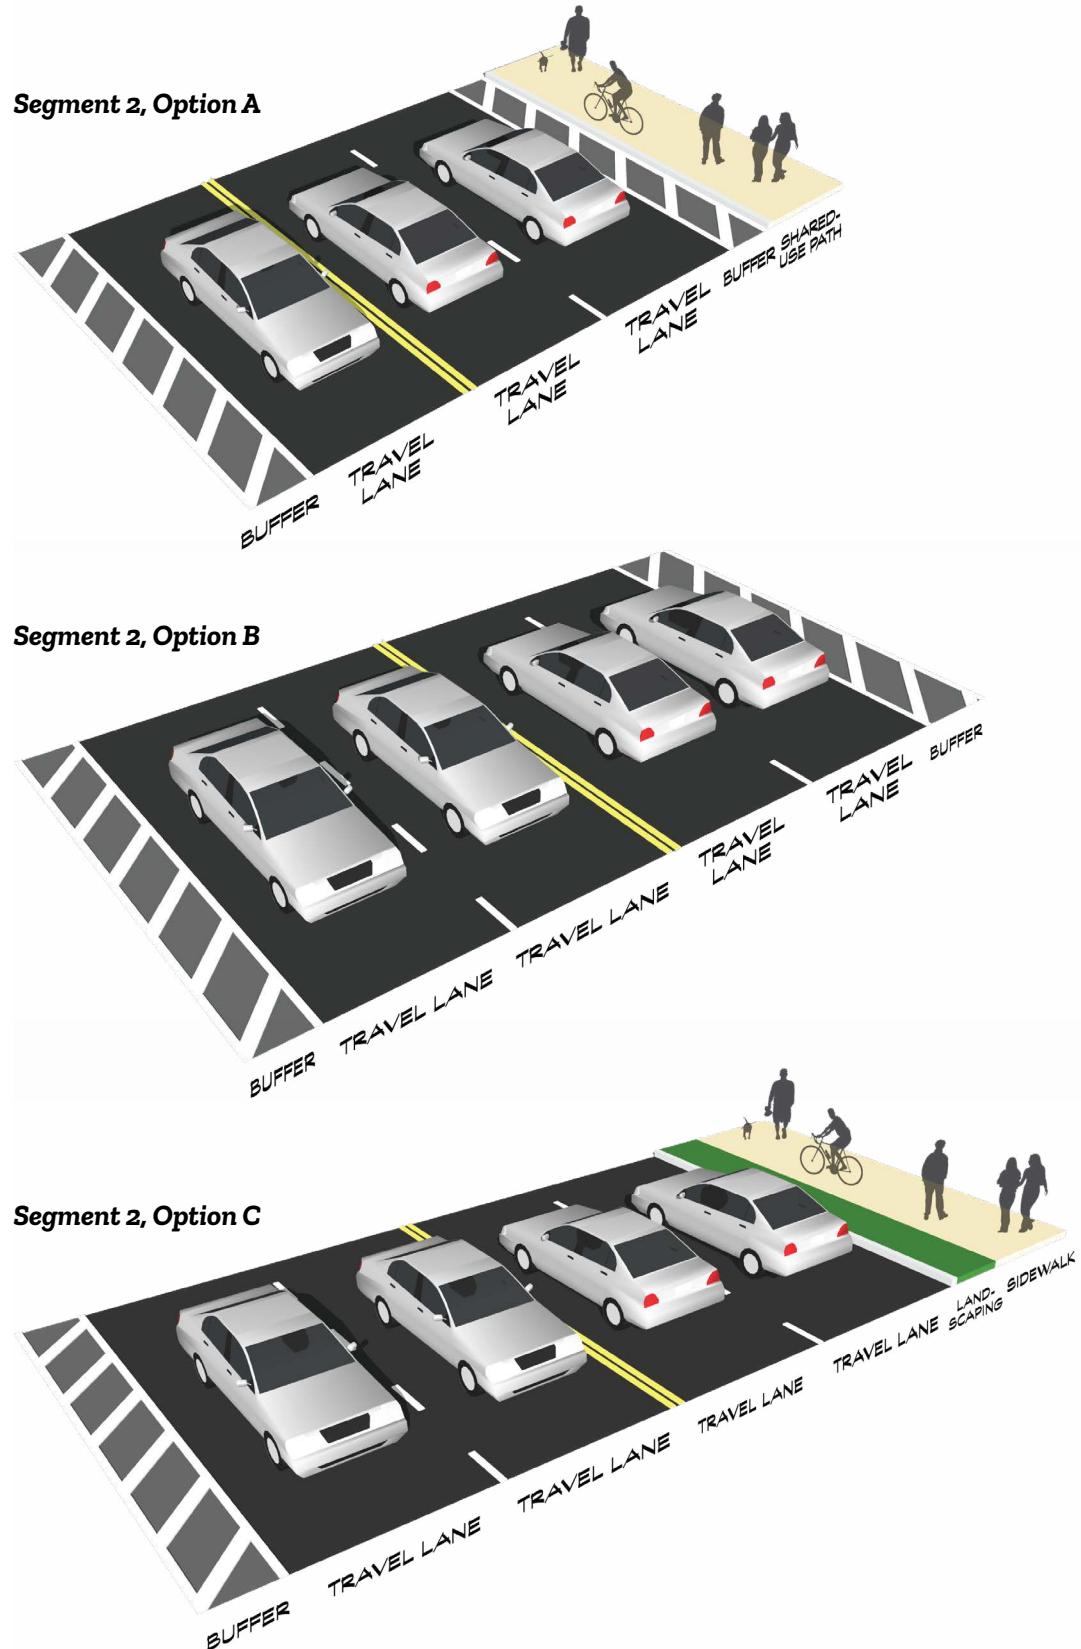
Meridian Design Alternative Cross-Sections – Segment 2
